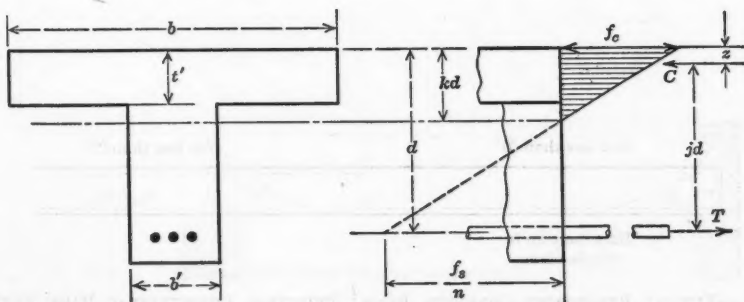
NOMENCLATURE FOR REINFORCED CONCRETE T-BEAM.
